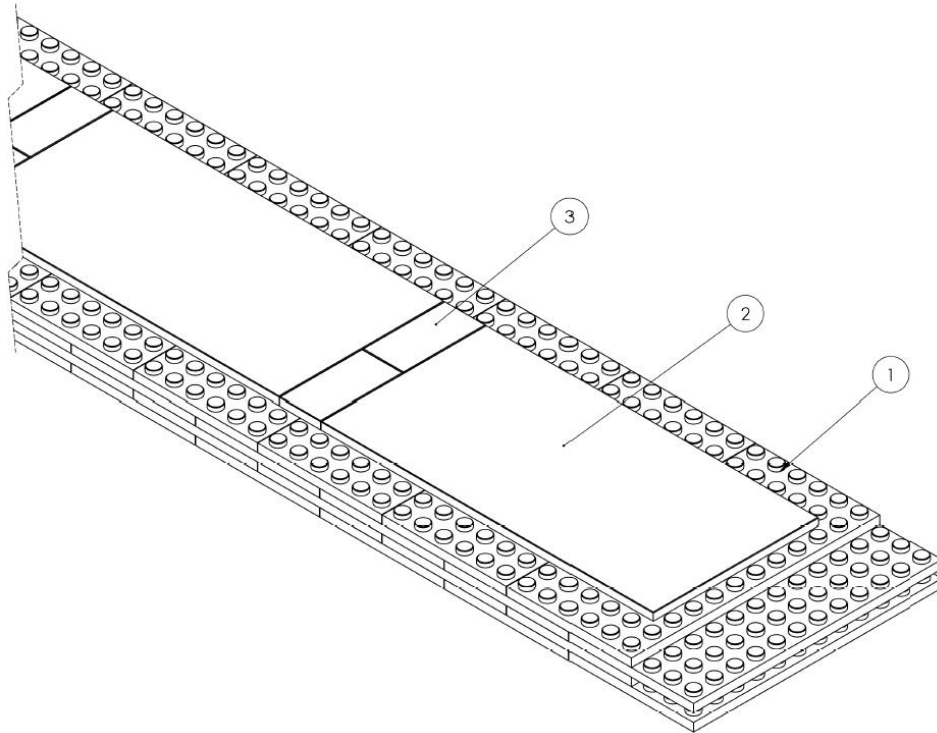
Rendering of part of the Bottom Plate section of the beam (SOLIDWORKS®)
